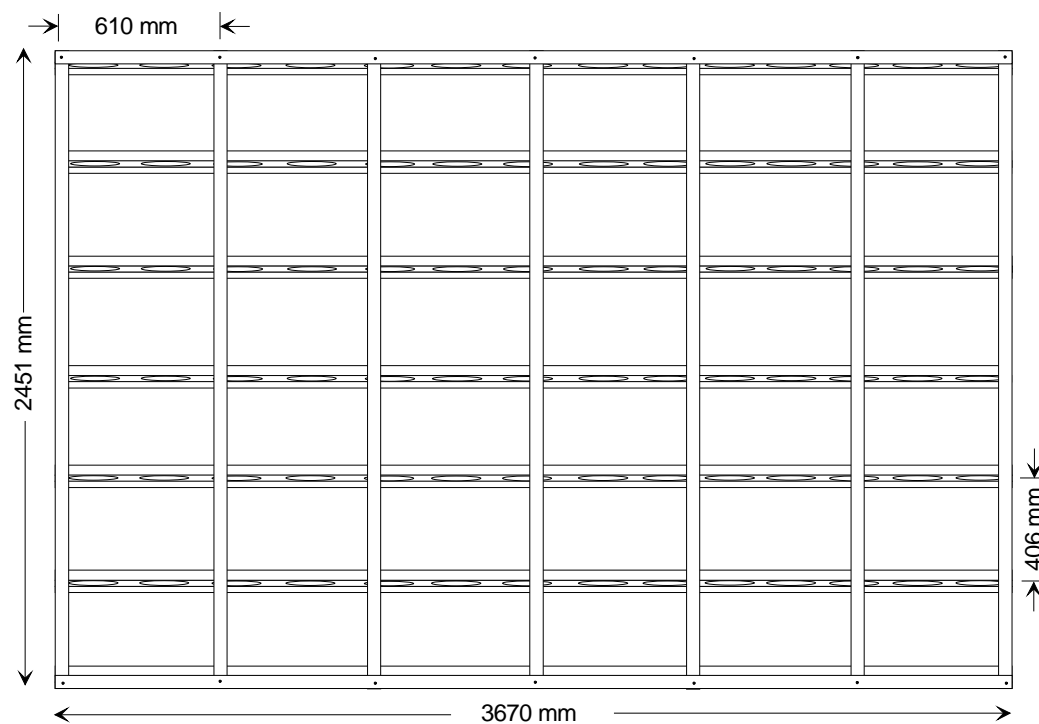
Sketch showing the construction of the load-bearing steel framing assembly with studs spaced 610 mm o.c., and resilient channels spaced 406 mm o.c. Other construction elements are unchanged from Figure A-1.
